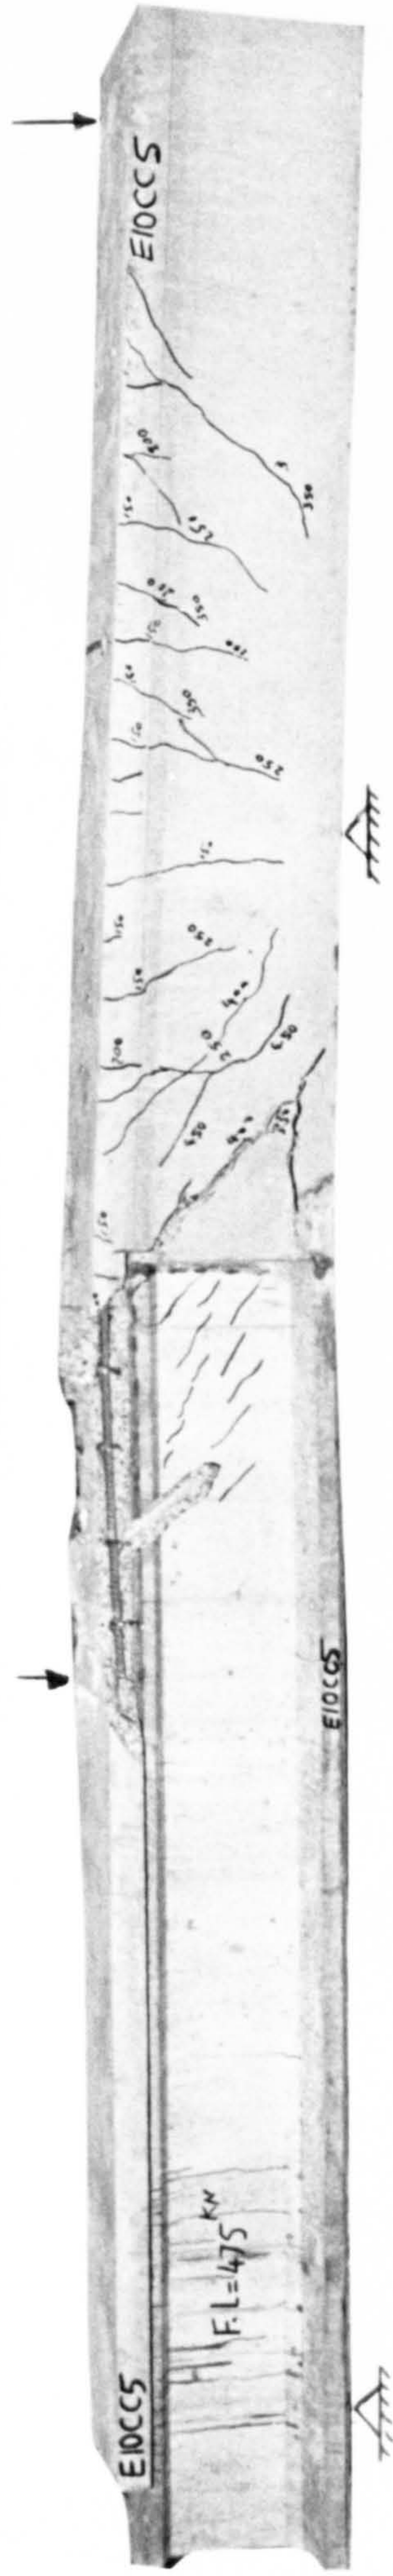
Longitudinal Elevation of Beam E10CC5 After Failure
